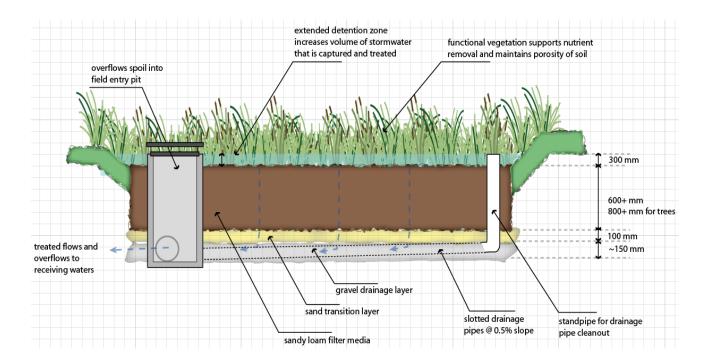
Bioretention system typical arrangement (Water by Design 2009)
